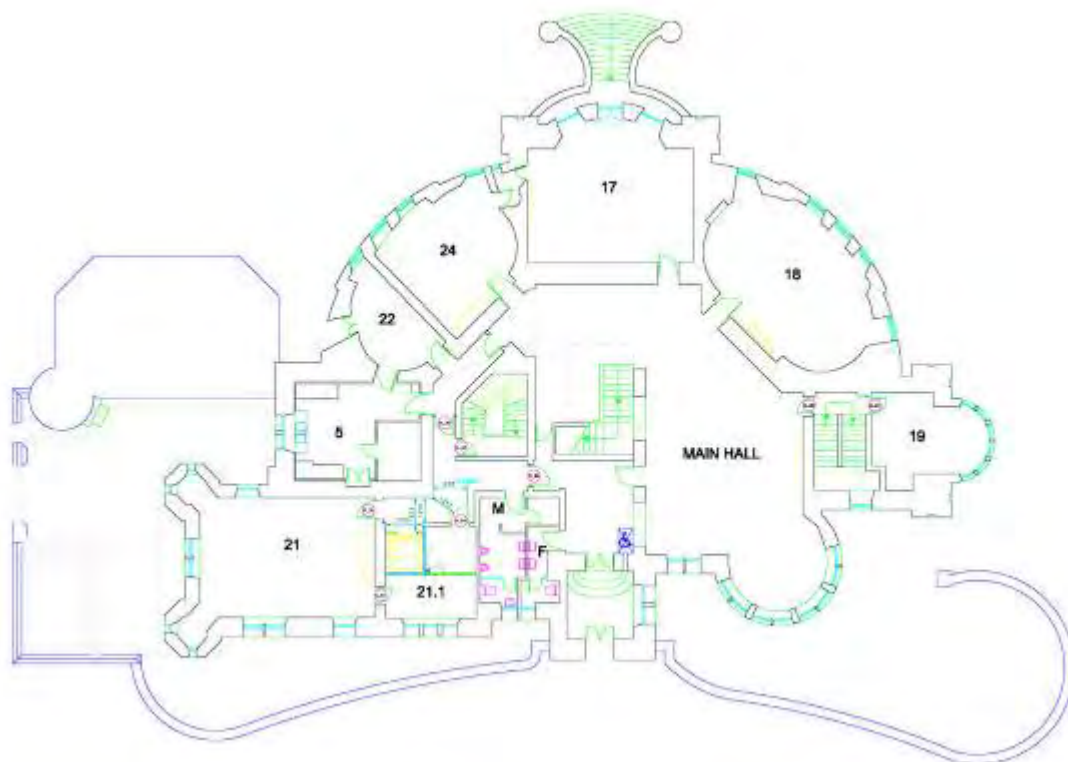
Ground floor plan of Airthrey Castle 2009 UoS
